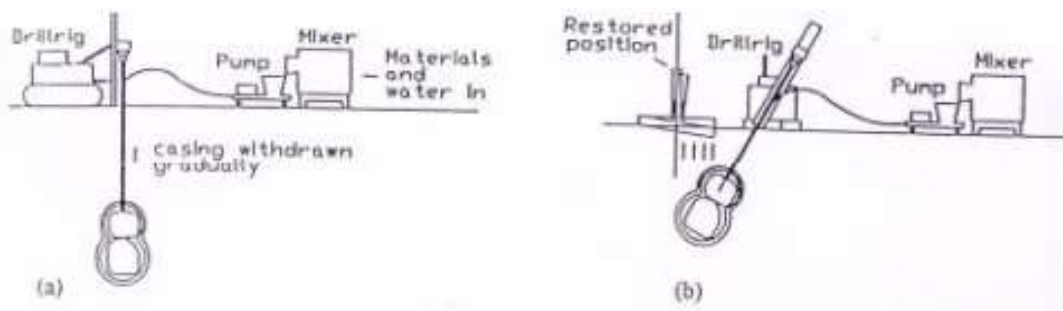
Remedial works by compaction grouting of a) road and b) below a foundation
